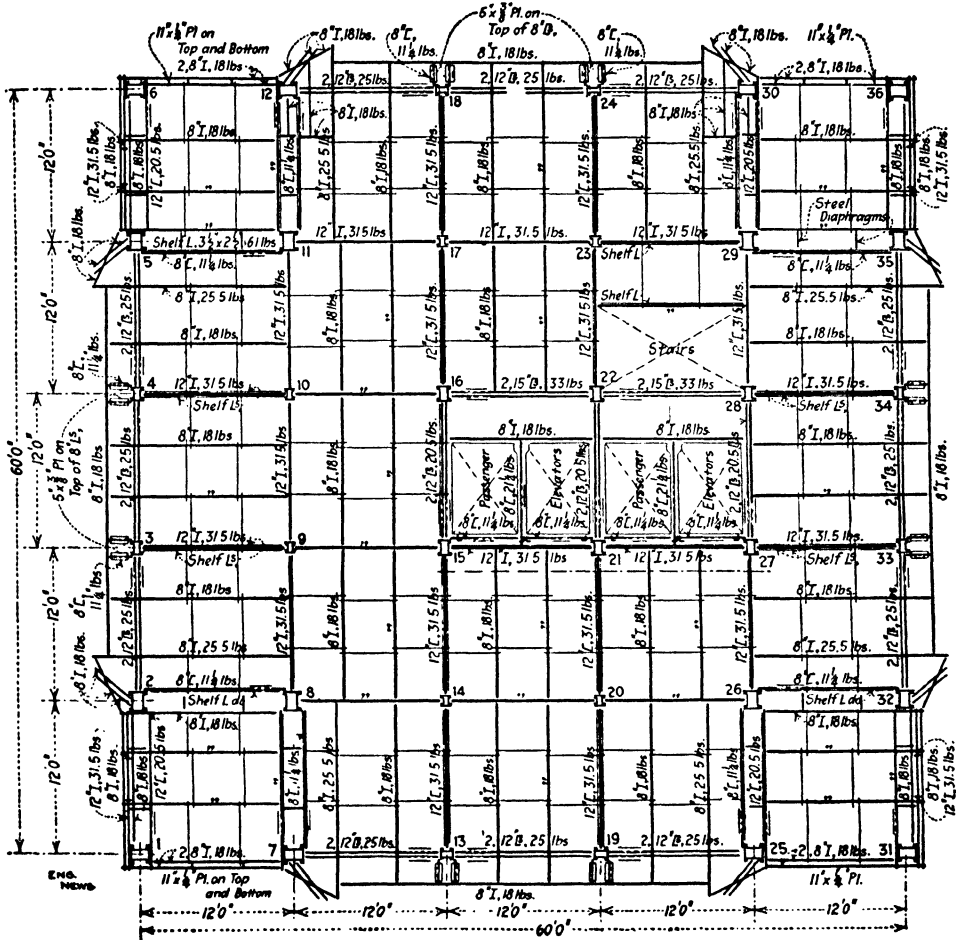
TYPICAL FLOOR PLAN OF SINGER TOWER.
